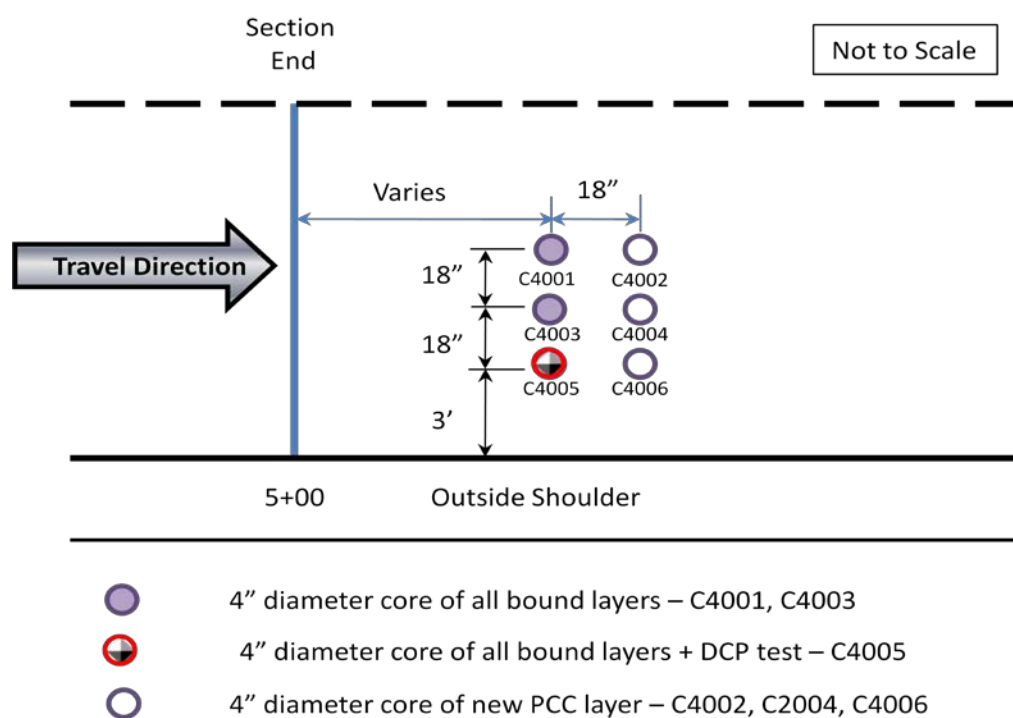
Standard sampling plan locations at leave end LTPP tests sections with new PCC layers.
